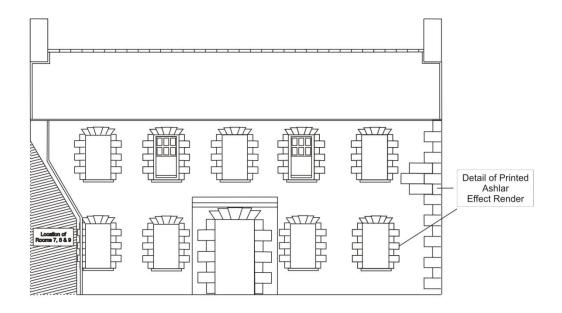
Overdale, Partial North Facing Elevation Scale 1:100
